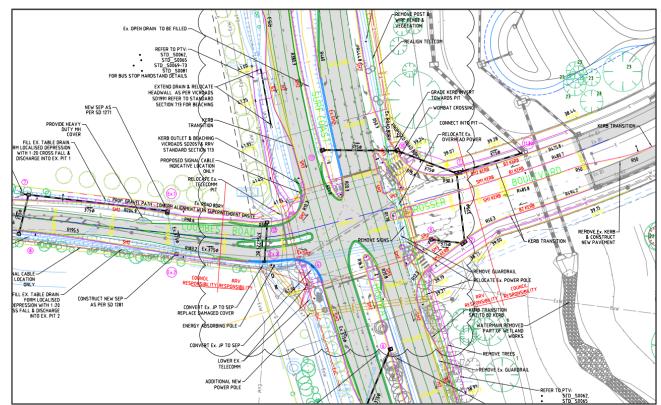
Coombes Road / Surf Coast Highway Signalised Intersection Construction Plan
